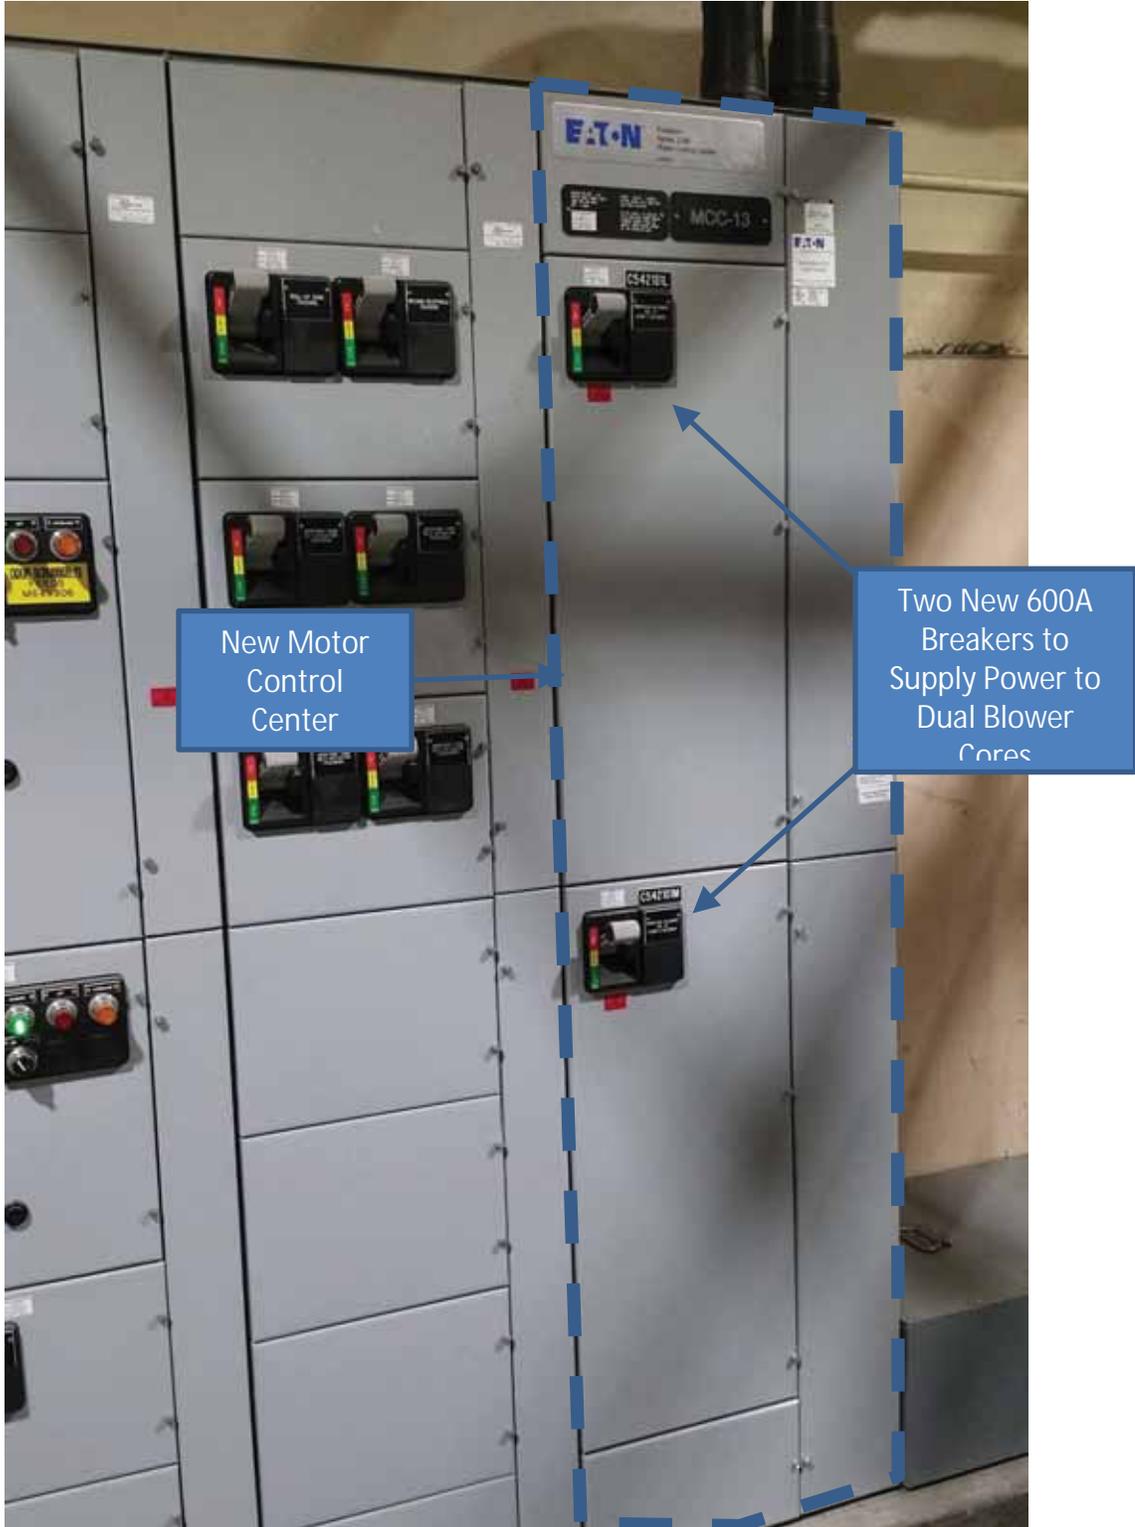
New Section Added to Existing Motor Control Center No. 13
